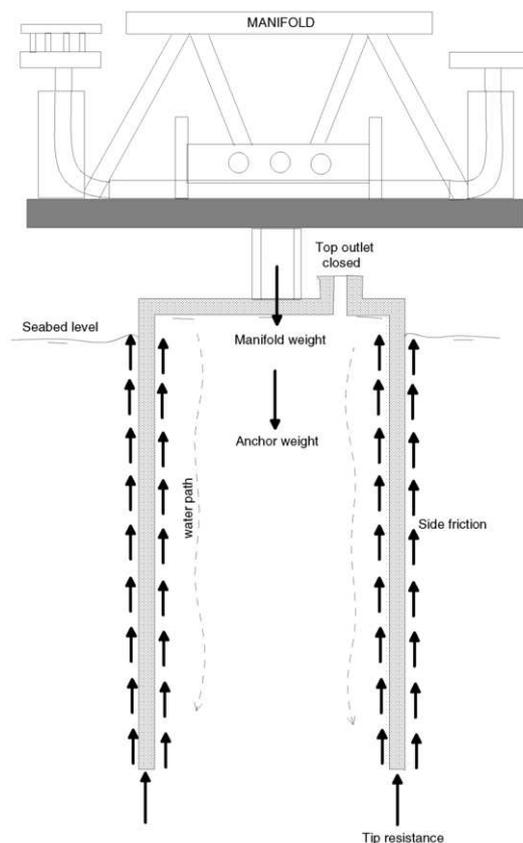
Forces acting in a skirted foundation foundation after a subsea module has been connected.
